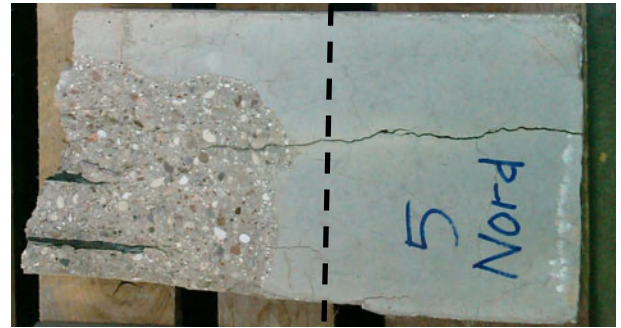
Concrete spalling areas of a section of Slab 5 after fire testing (the support line is dotted on the slab and the fire-exposed side is on the left)
